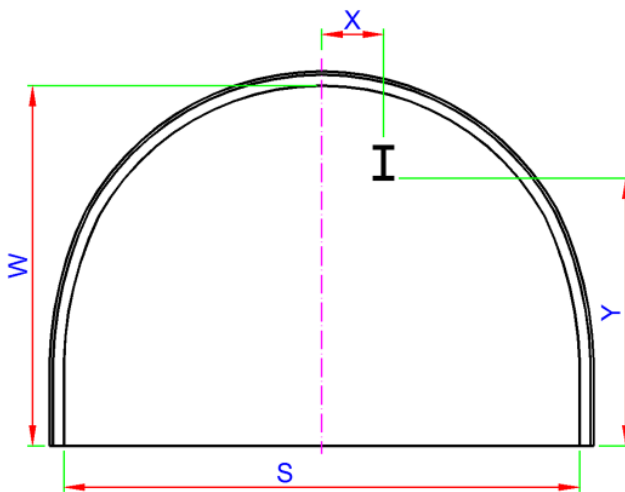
Orientation of suspended monorail track to cross-section of the roadway
